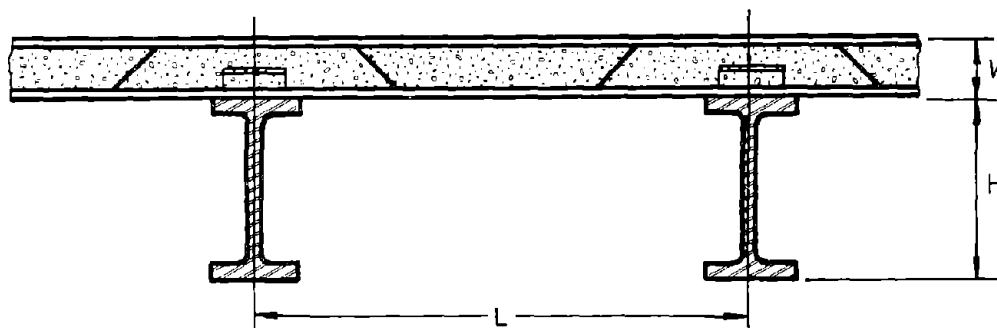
Composite Beam-Slab Section (COE, 1965)
